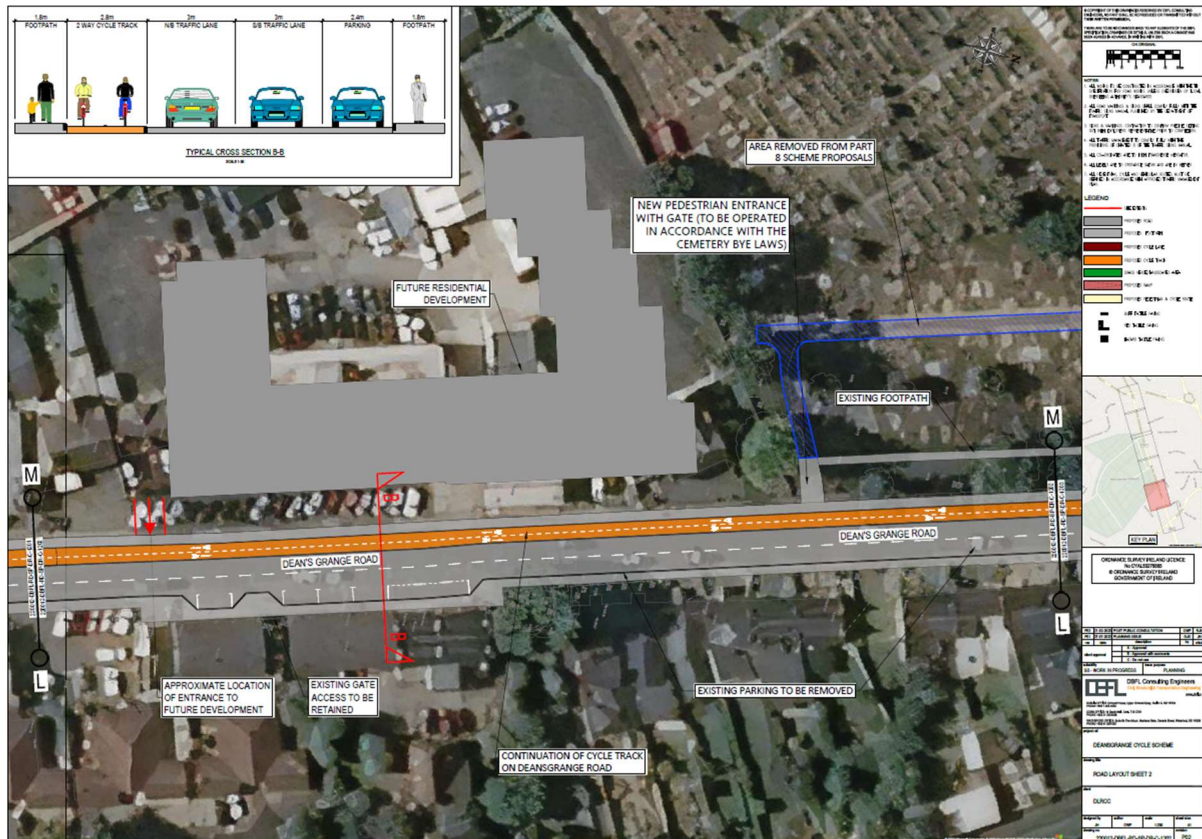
Outline design and layout of proposed scheme- Section 2 (source: DBFL Consulting Engineers)
